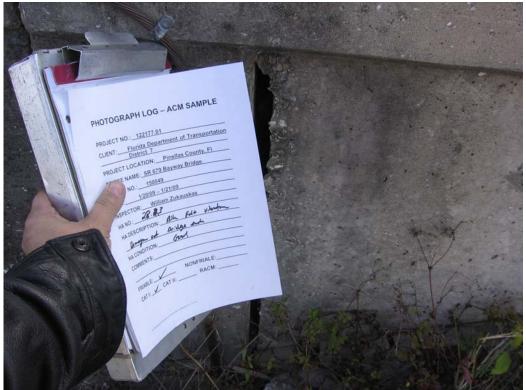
01/21/09 - SAMPLE 28.3 - HA 28 BLACK VIBRATION DAMPERS AT NORTH AND SOUTH BRIDGE ENDS
